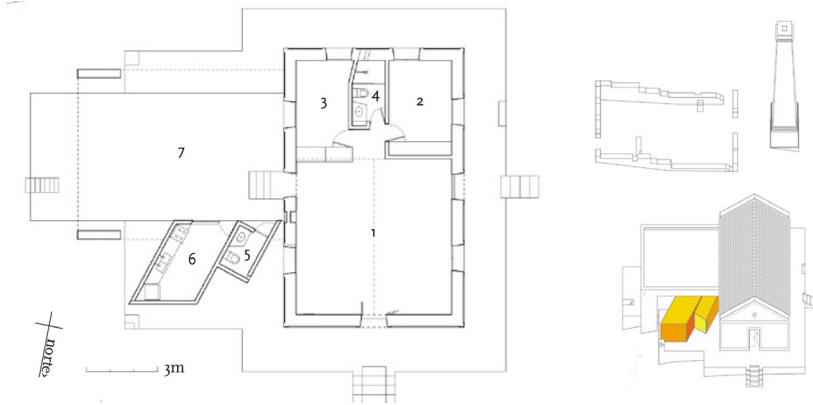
The space plan layer (Paulo Raposo, 2015)
